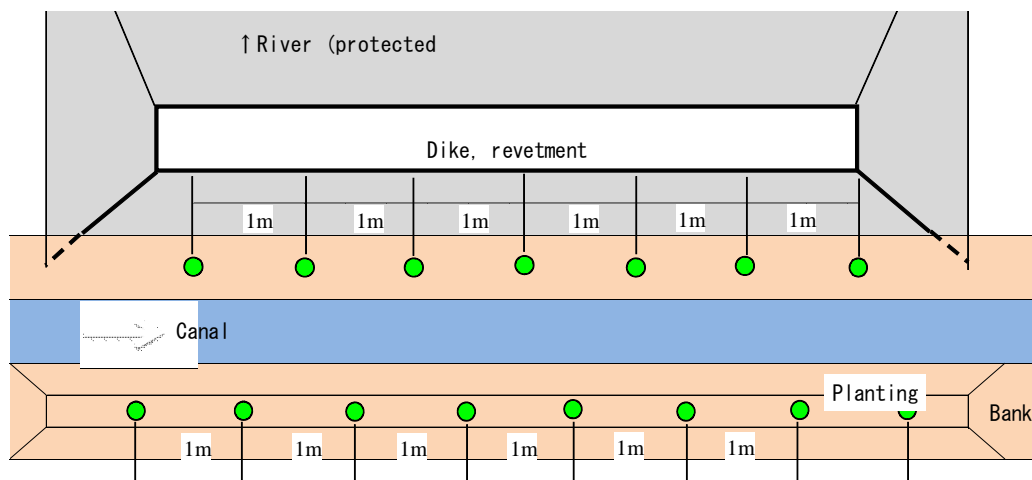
Layout of Planting Points of Riparian Afforestation (Type B)
